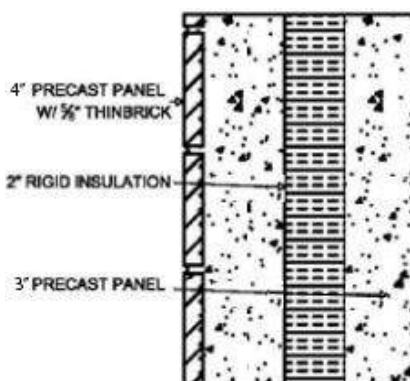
Architectural Precast Panels. Image courtesy of Nitterhouse Concrete
